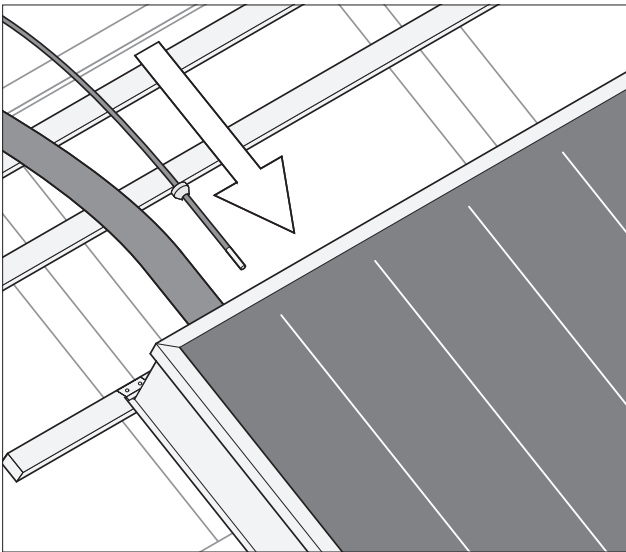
Slip rubber seal over cable, insert solar sensor into sensor sleeve; close opening with rubber seal and lead cable through roof.
